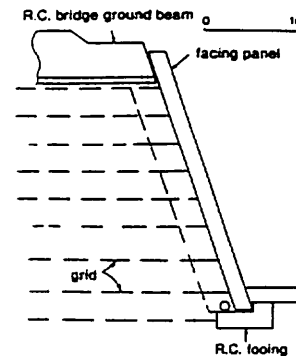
Continuous rigid facing of pre-cast concrete full-height panel for geosynthetic-reinforced bridge abutments (McCaul, 1992).
